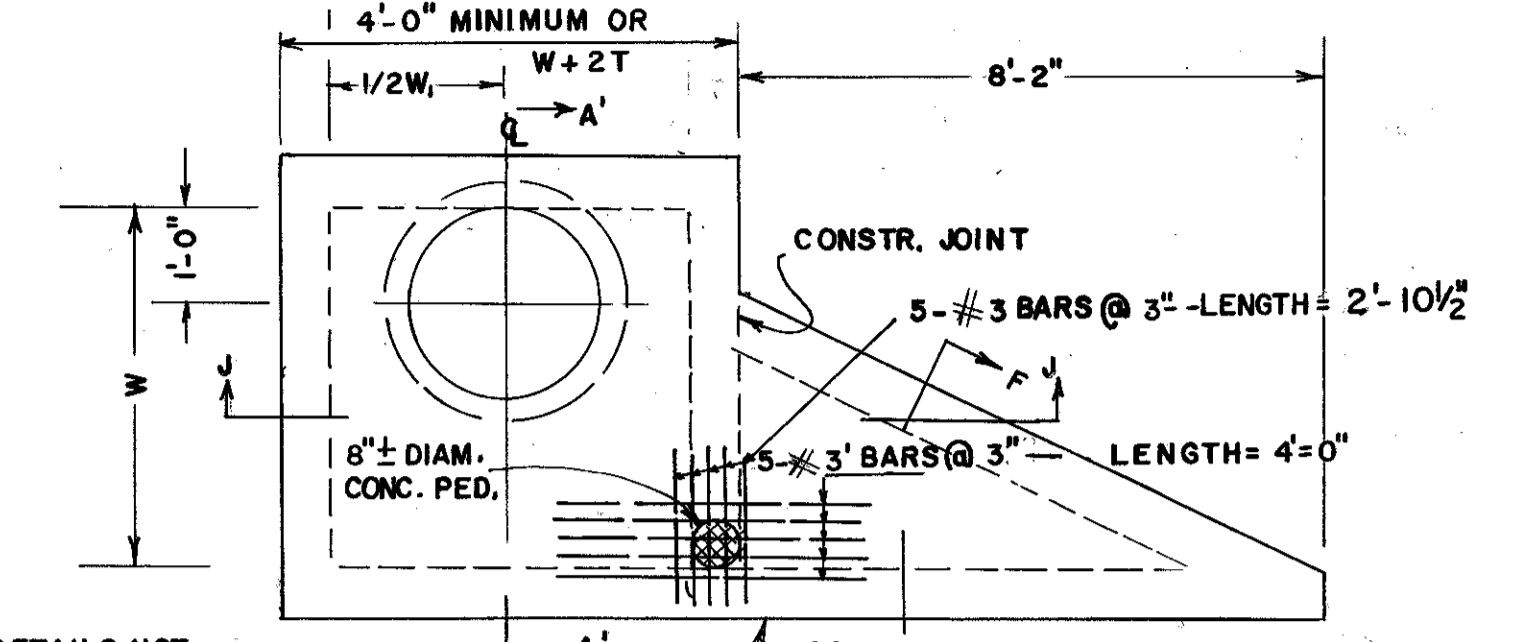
DETAIL OF TOP SLAB, REINF. STEEL & CLEARANCES REQ'D.
